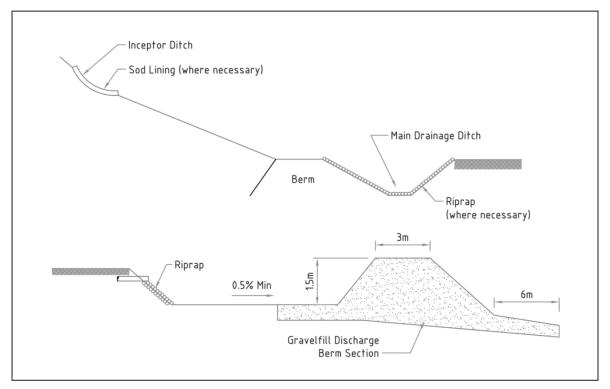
Cross sections of a stormwater ditch and a basin used in landfills (Bagchi, 2004)
